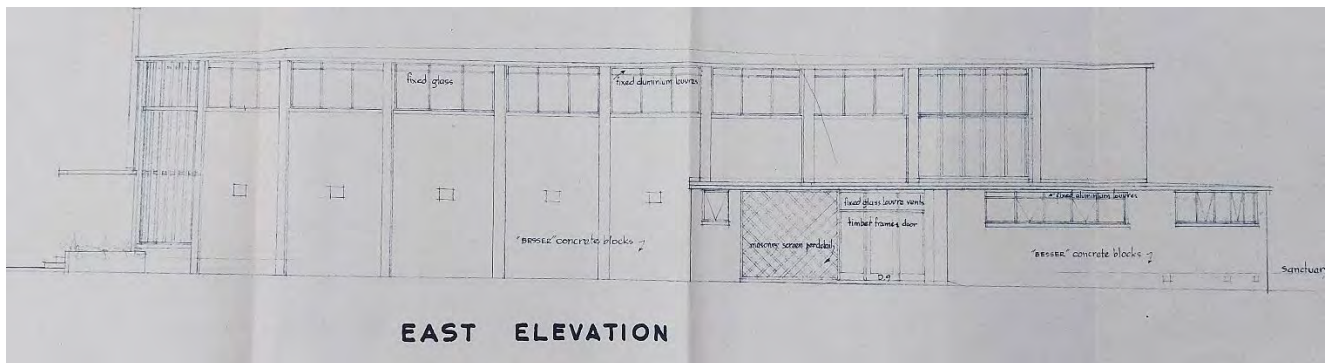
East elevation, drawing by architect Robert O Ellis, dated July 1962 (Source: PROV, PB File)
